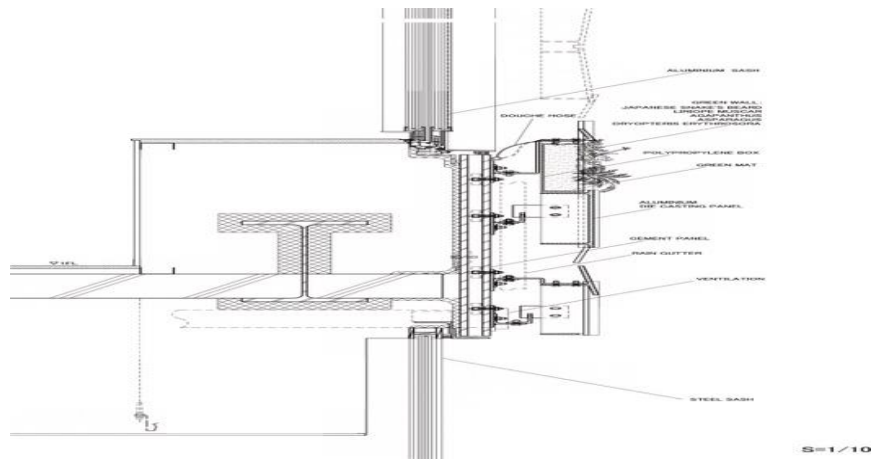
A Picture of detail of Architectural Working Drawing with Building Section
